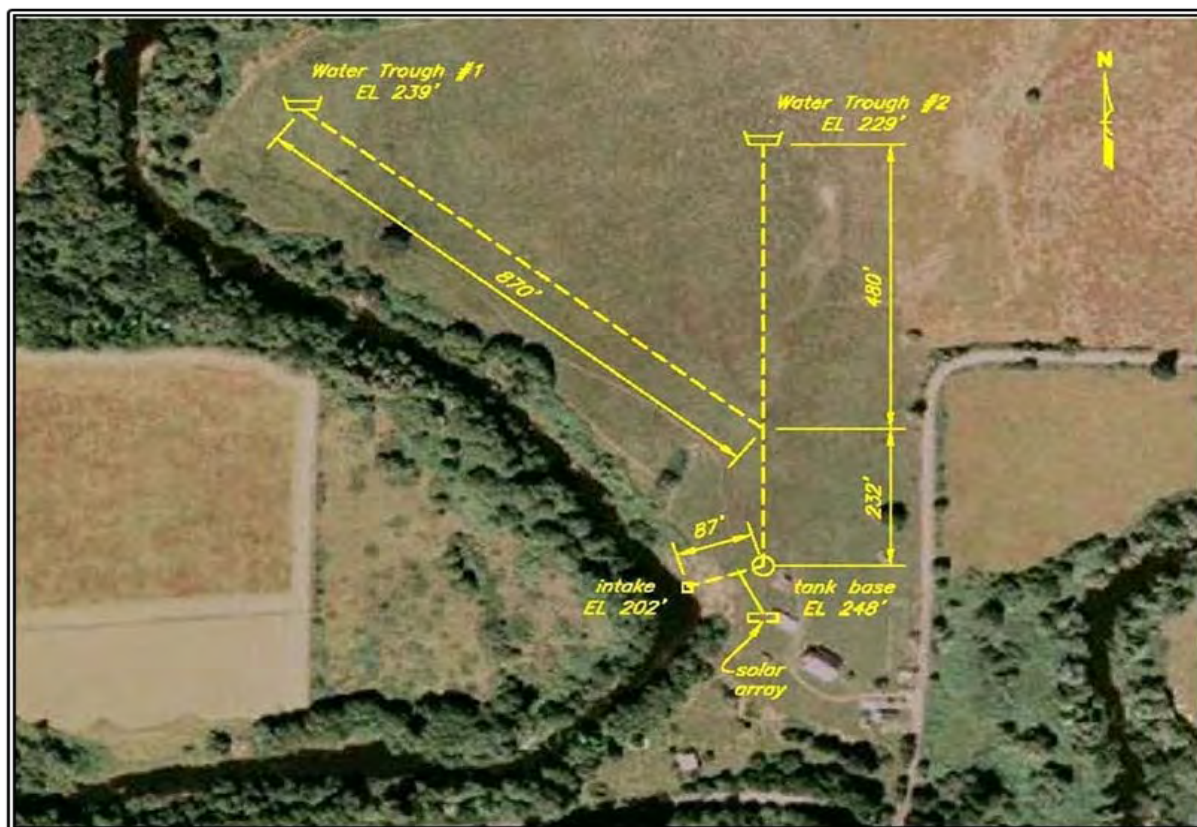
Layout of a proposed stock water system for Design Example 1.
